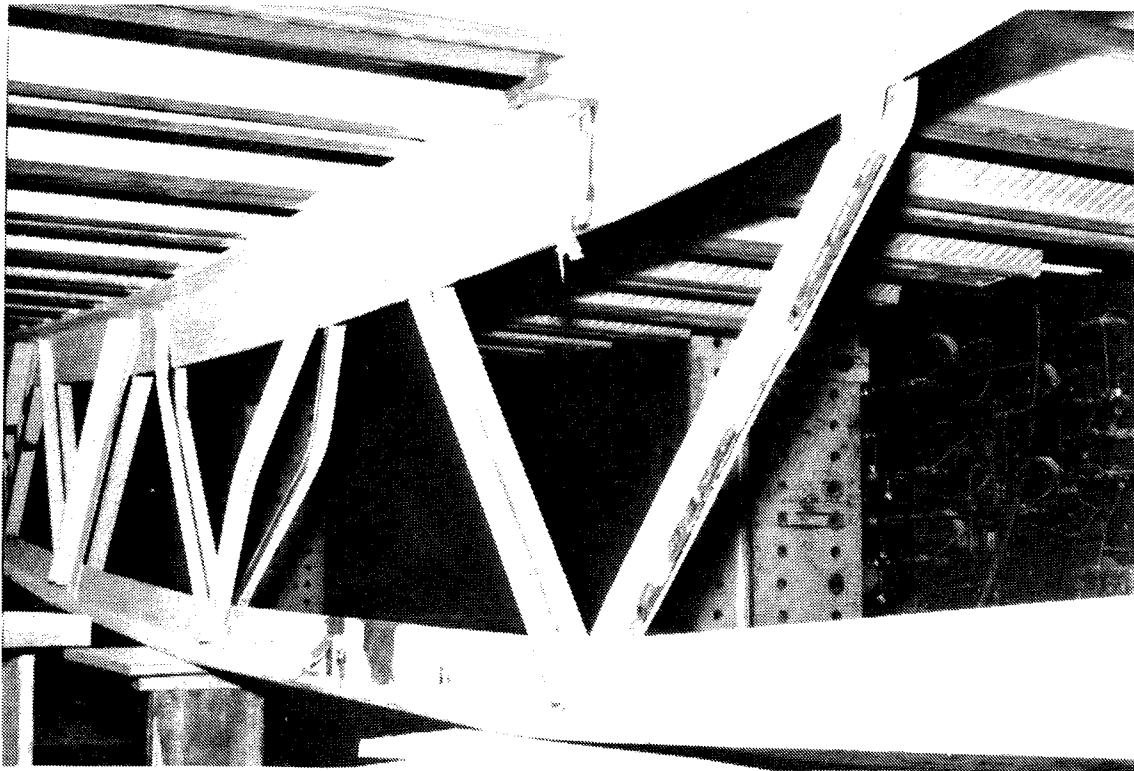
Bottom chord after truss failure (no load)
